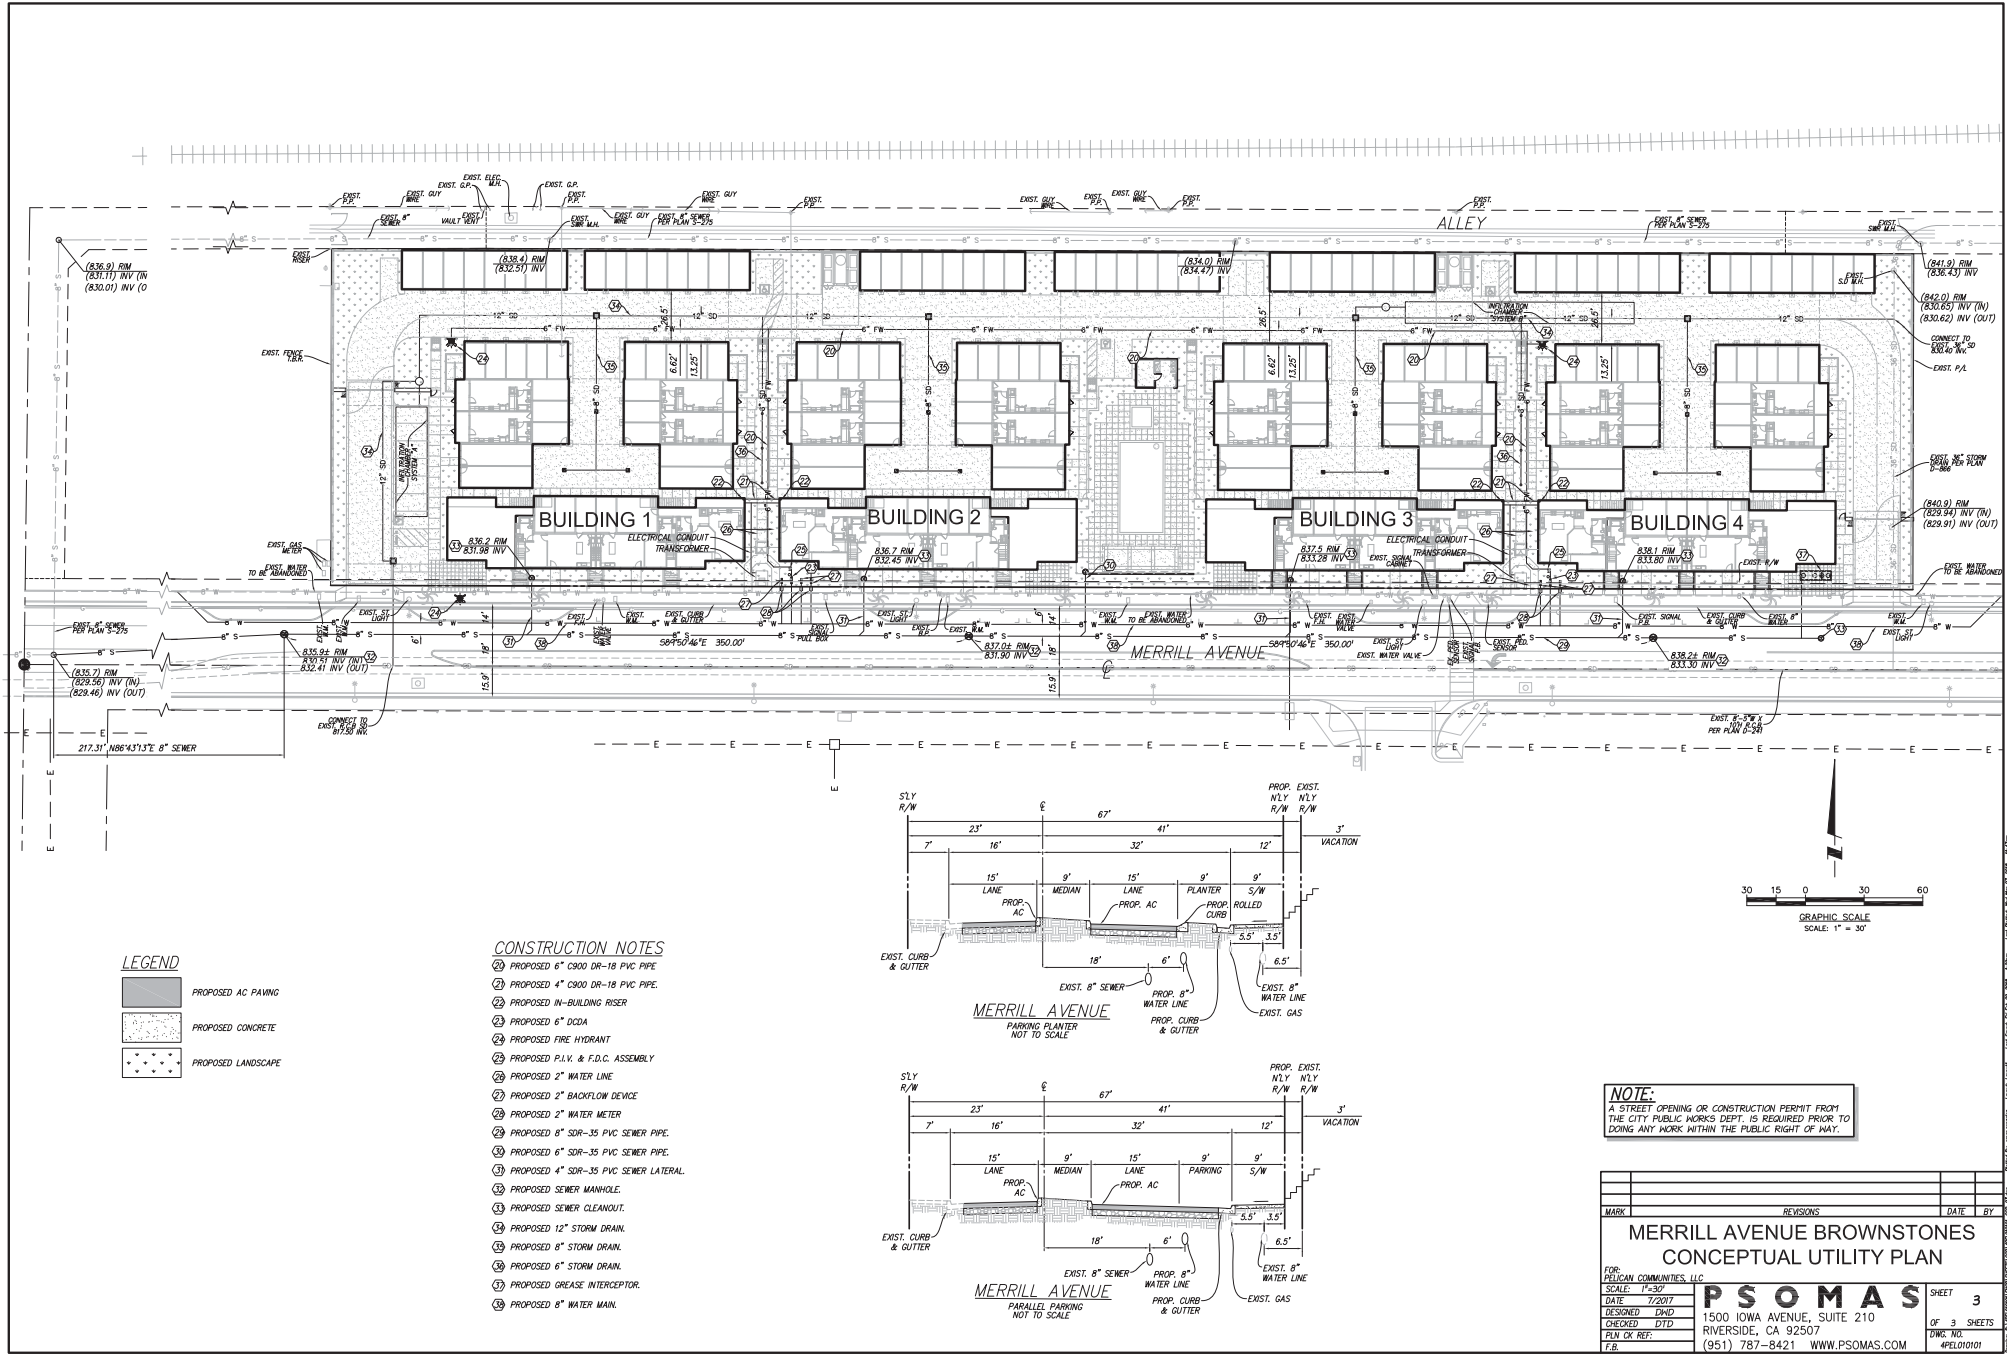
Project Plans (Conceptual Utility Plan)
